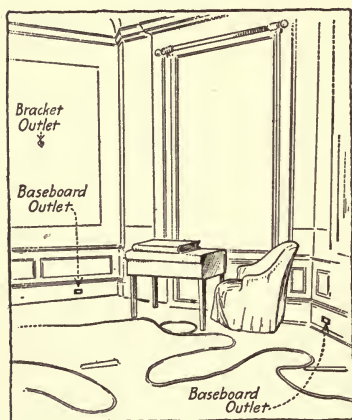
Drawing room showing bracket and baseboard outlets.
